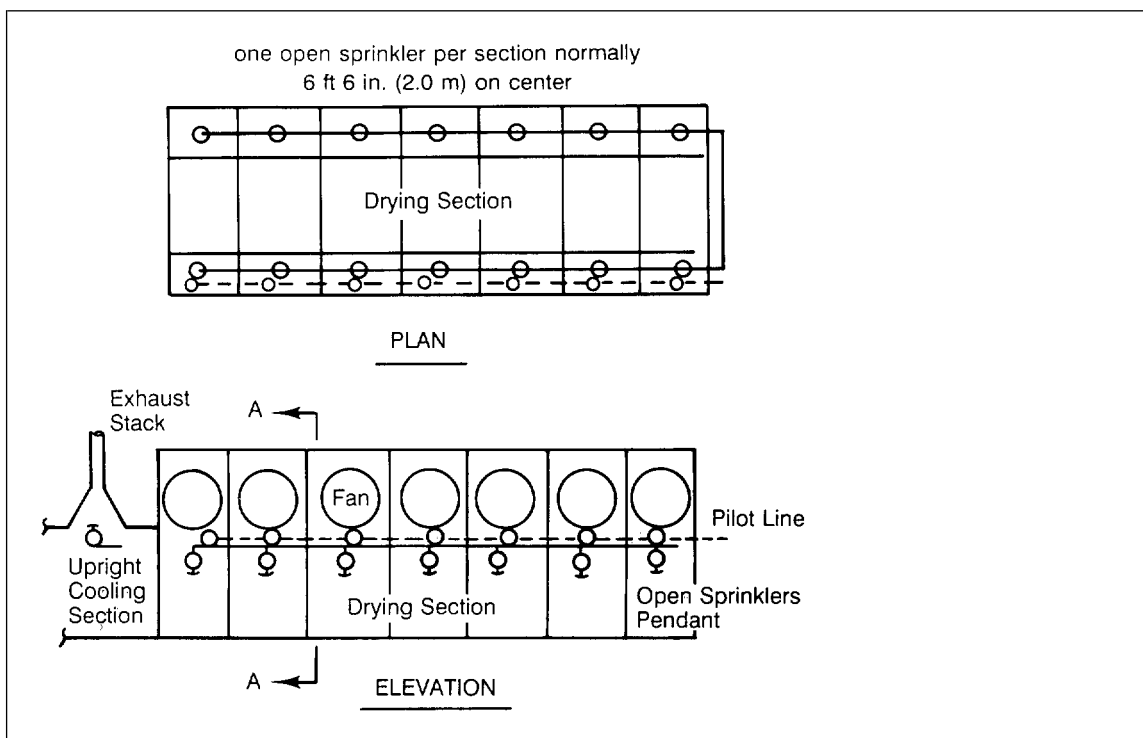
Typical arrangement of deluge protection for special vertical jet-type dryer. See Fig. 9 for additional protection details.
